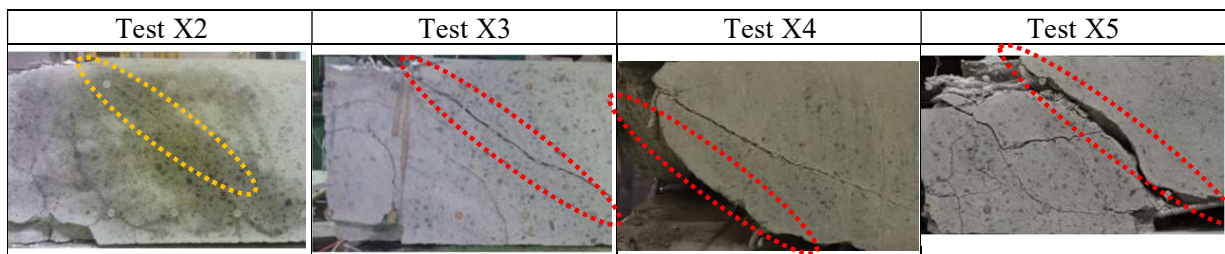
Cross sections of slabs after impact, wider crack observed. The dotted shape that highlights the wider crack is inclined at 37° from the slab plane
